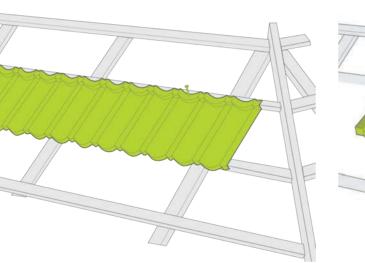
INSTALLING OF ROW 2 IN THE RIDGE AREA
